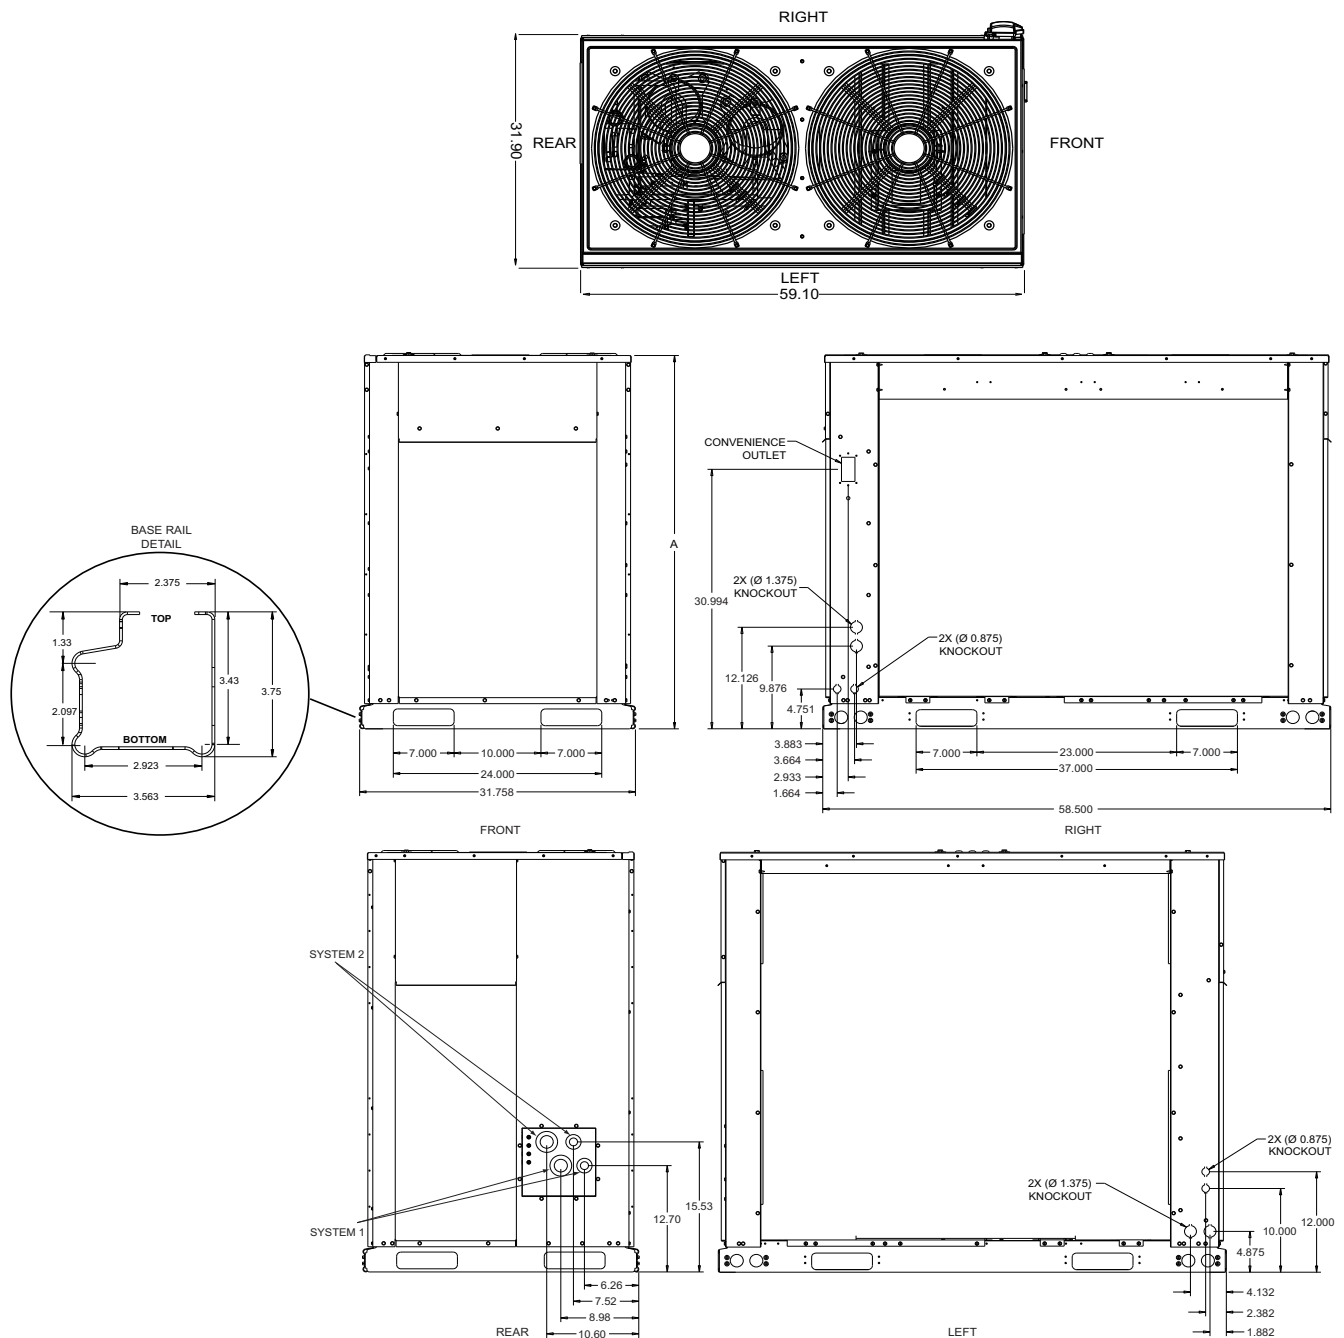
PC090, PE090, and PC120 Unit Dimensions
